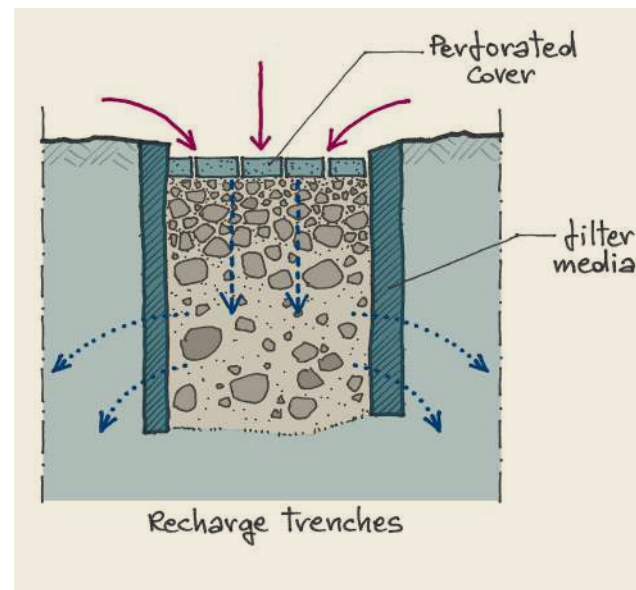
SECTION OF A RECHARGE TRENCH
